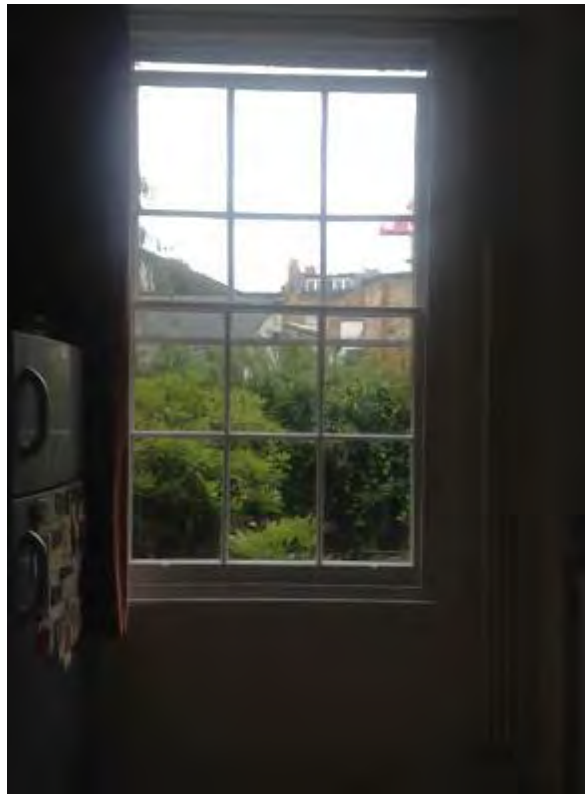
Rear Ground Floor Window at No.14 Chamberlain Street
